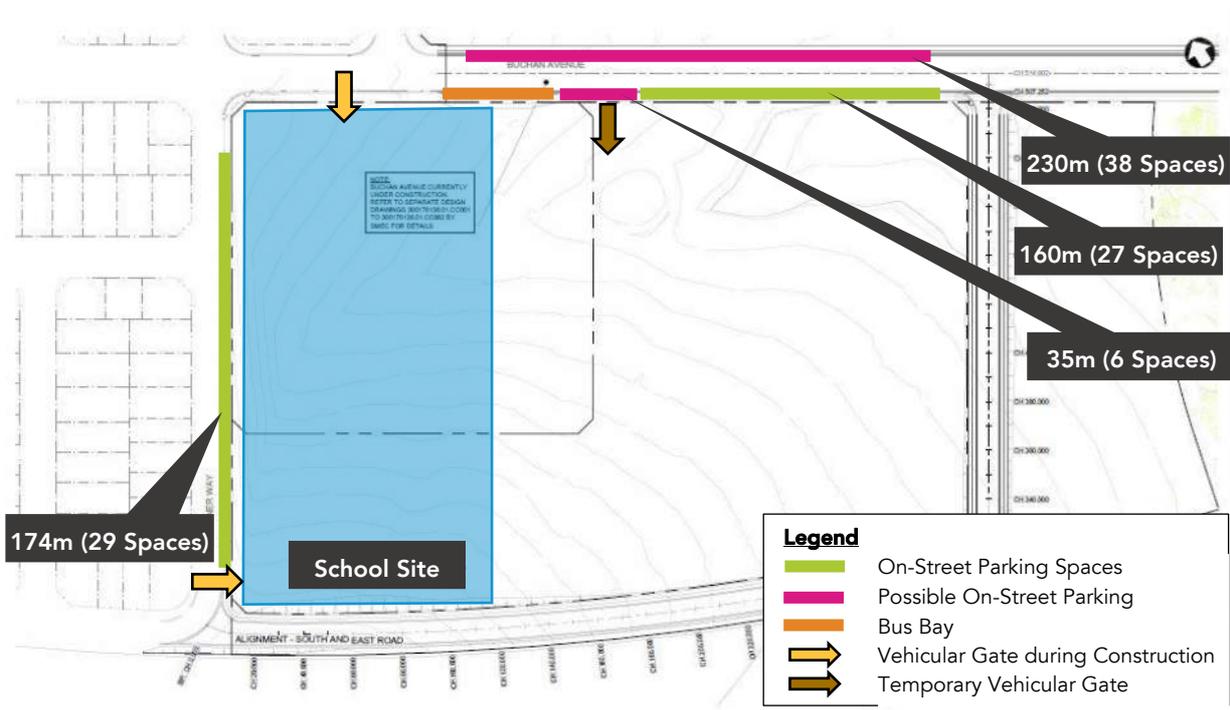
On-Street Parking Spaces on the vicinity of the Site
